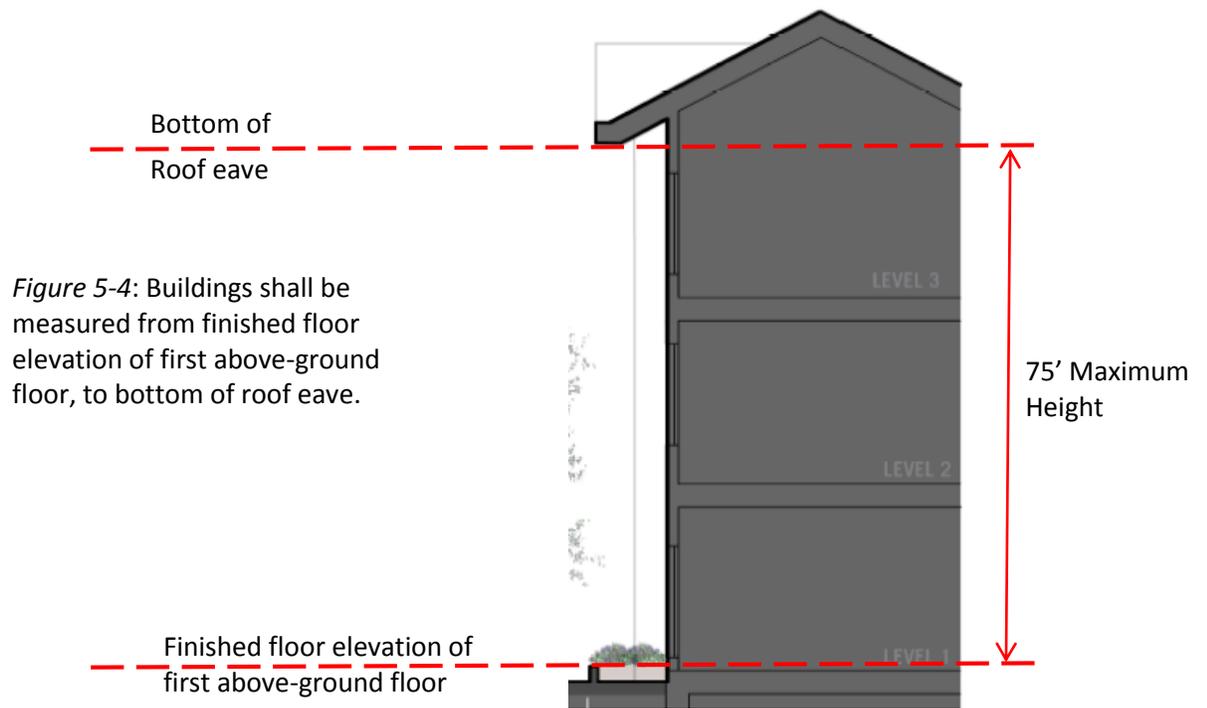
Buildings shall be measured from finished floor elevation of first above-ground floor, to bottom of roof eave.
